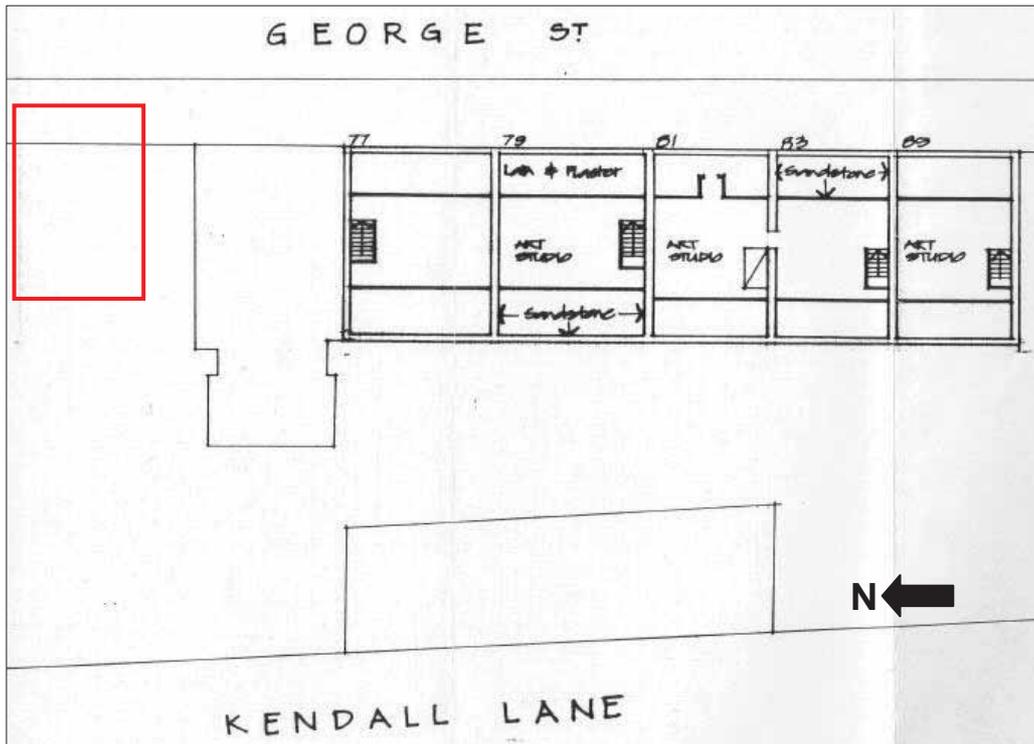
The Attic Plan for the Kendall Lane buildings. Note that the subject site is not included, as it didn't have an attic.
